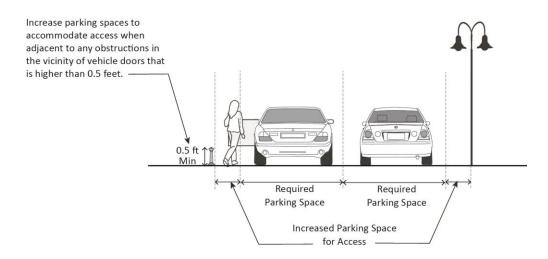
D.3: PARKING SPACES ABUTTING WALL OR FENCE
